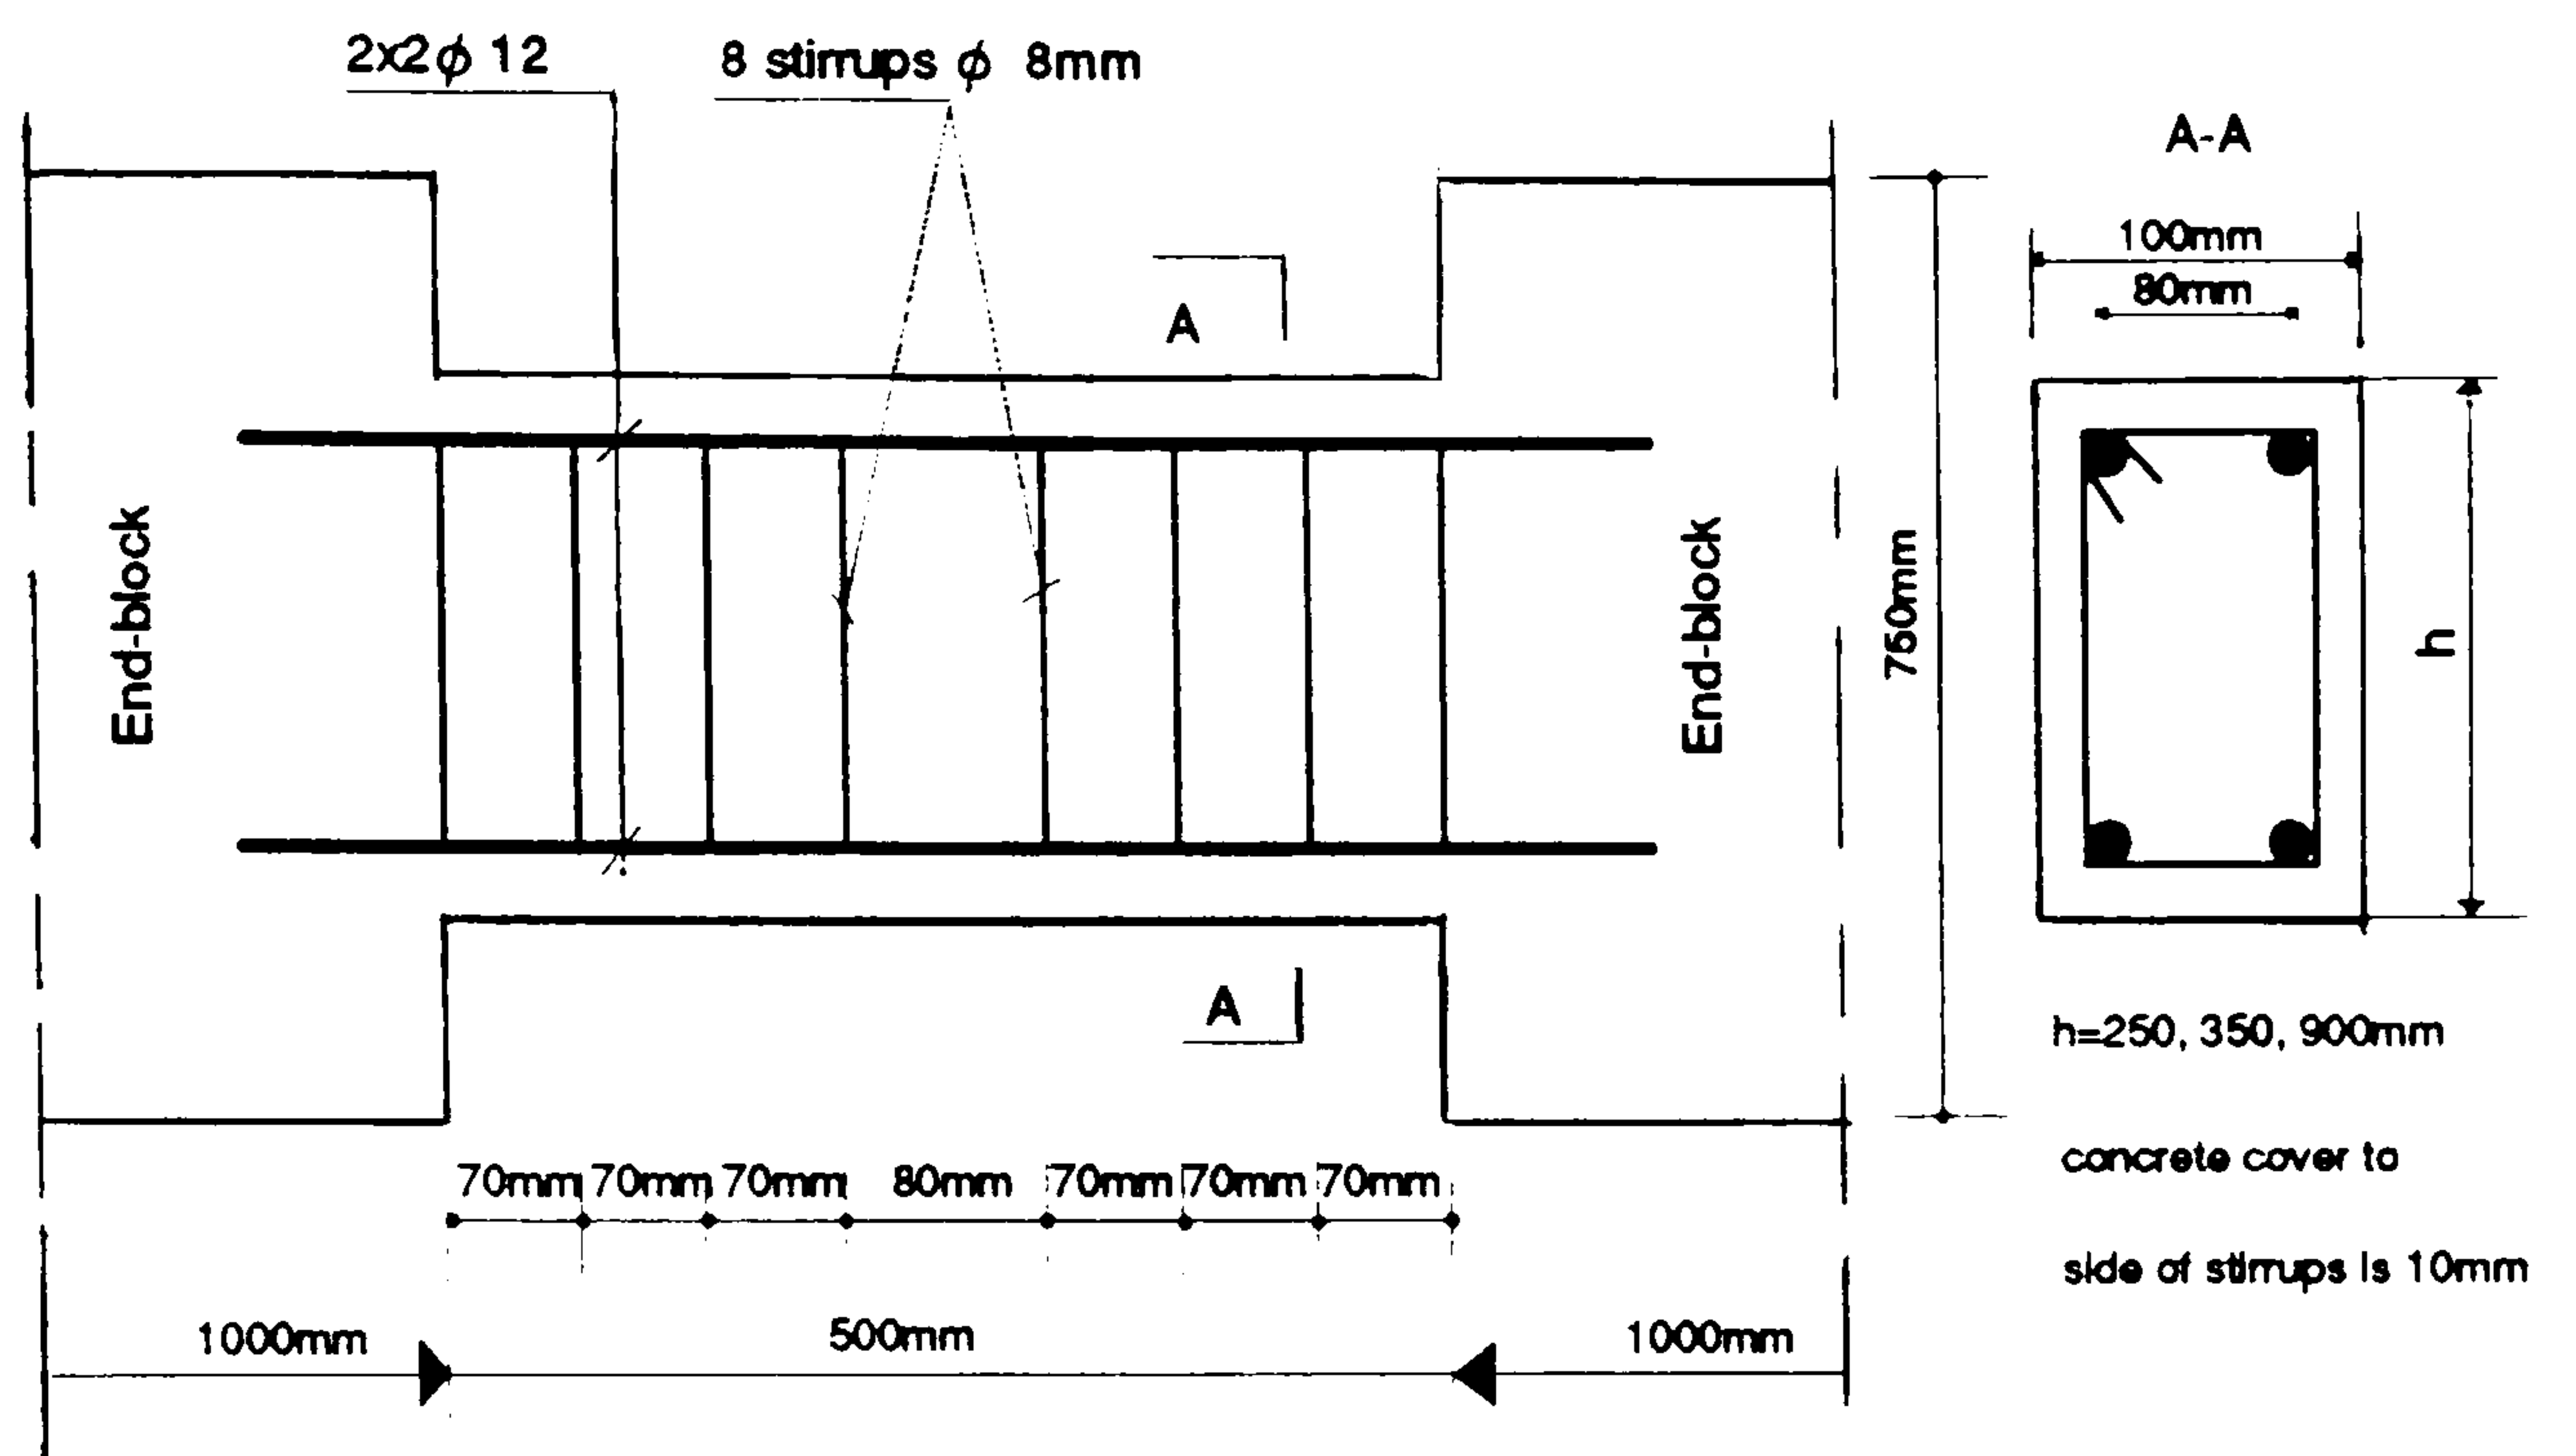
Dimensions of the coupling beam reinforced only with stirrups
